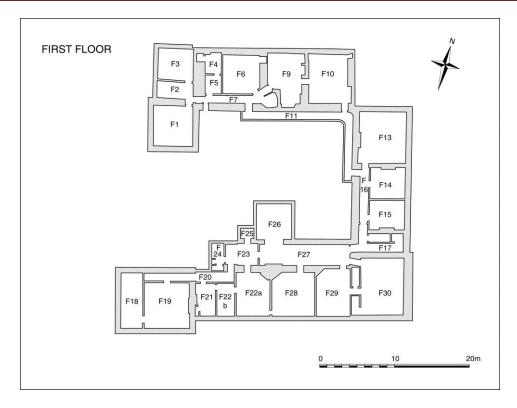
Plan of the Abbey First Floor West, North and East Ranges with South Range raised First Floor (Andy Isham)
